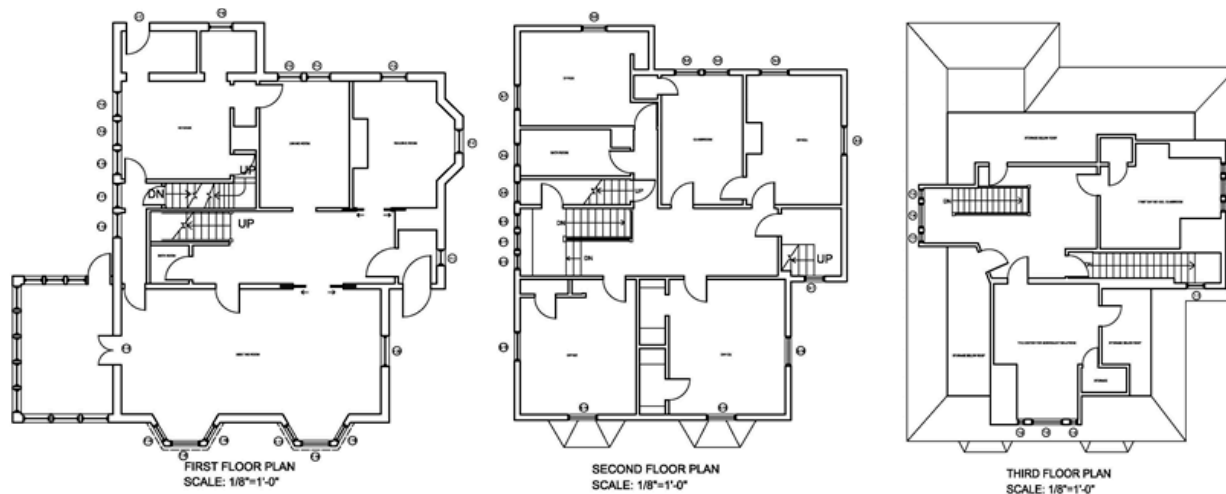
Layout of the meetinghouse. Left to right: First, second, and third floors. Not shown: Basement.
